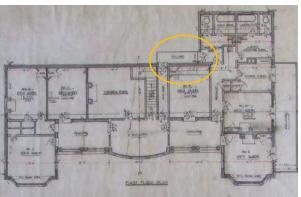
Original first-floor plan showing (circled) the location of the subject balcony at first-floor level.
